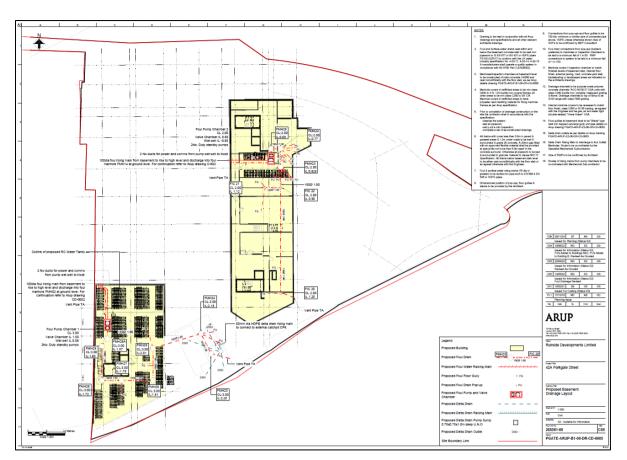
Extract from Surface Water Management Plan depicting proposed basement drainage layout (Source: ARUP, 2024).
